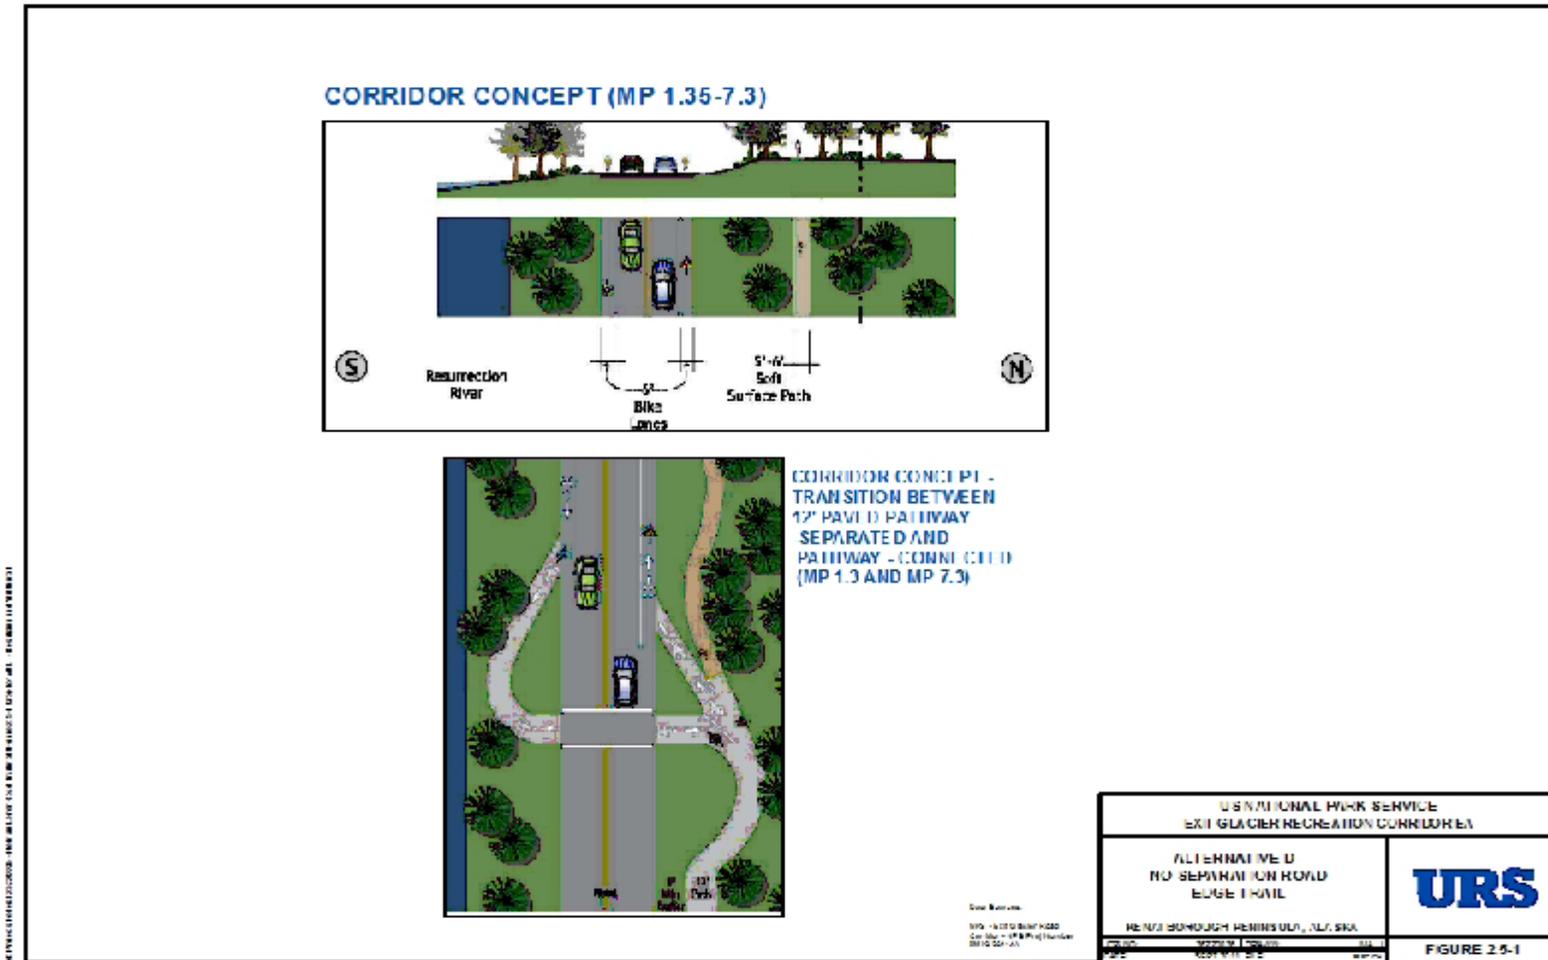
Alternative D – No Separation Road Edge Trail and Upgrades to Existing Trails: MP 1.3-7.3
